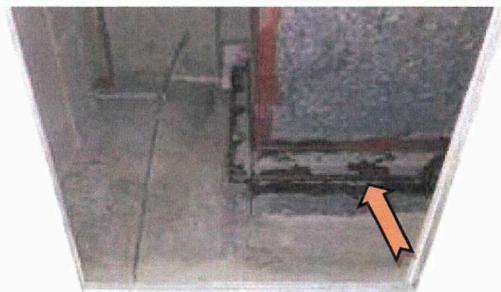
Level 10 – Service Riser– North end – Open heater bank and ductwork – Asbestos-containing red mastic. Sample 22505-001-027
